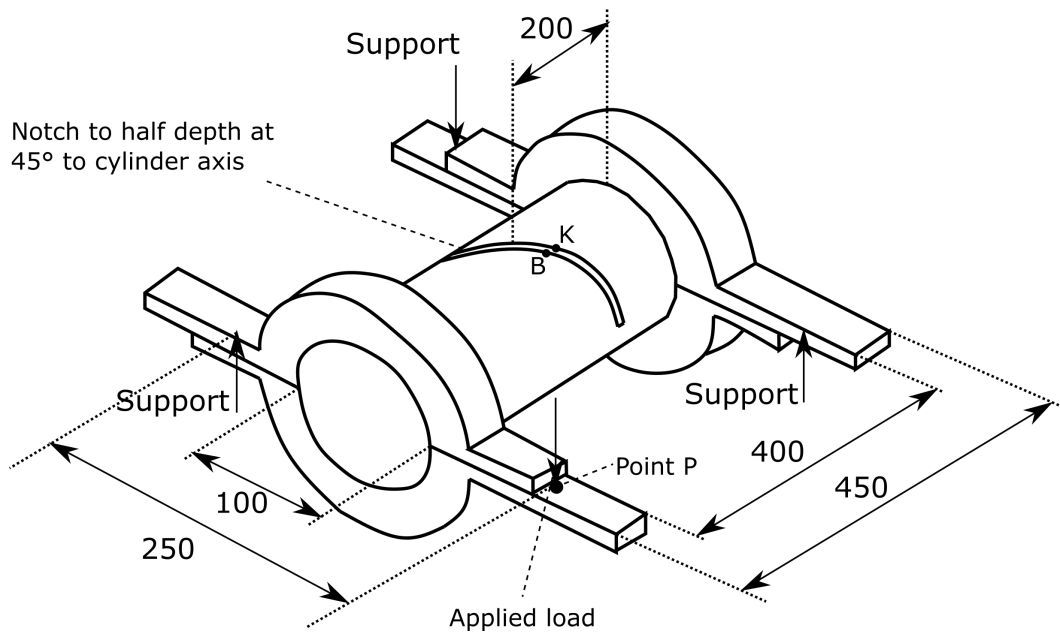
Test setup and dimensions for cylindrical skew notched concrete beam
